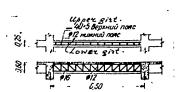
Rigid steel welded skeleton of the floor supporting beam.
